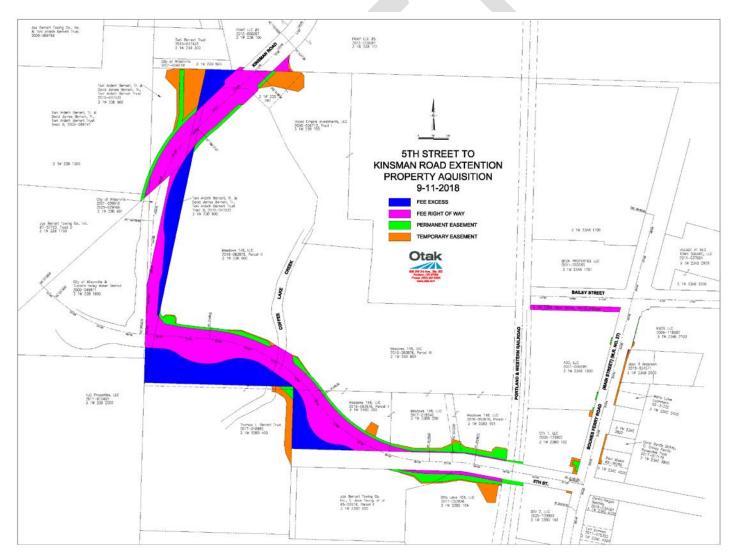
Year 2000 Urban Renewal Plan $12^{\rm th}$ Amendment Page 2
